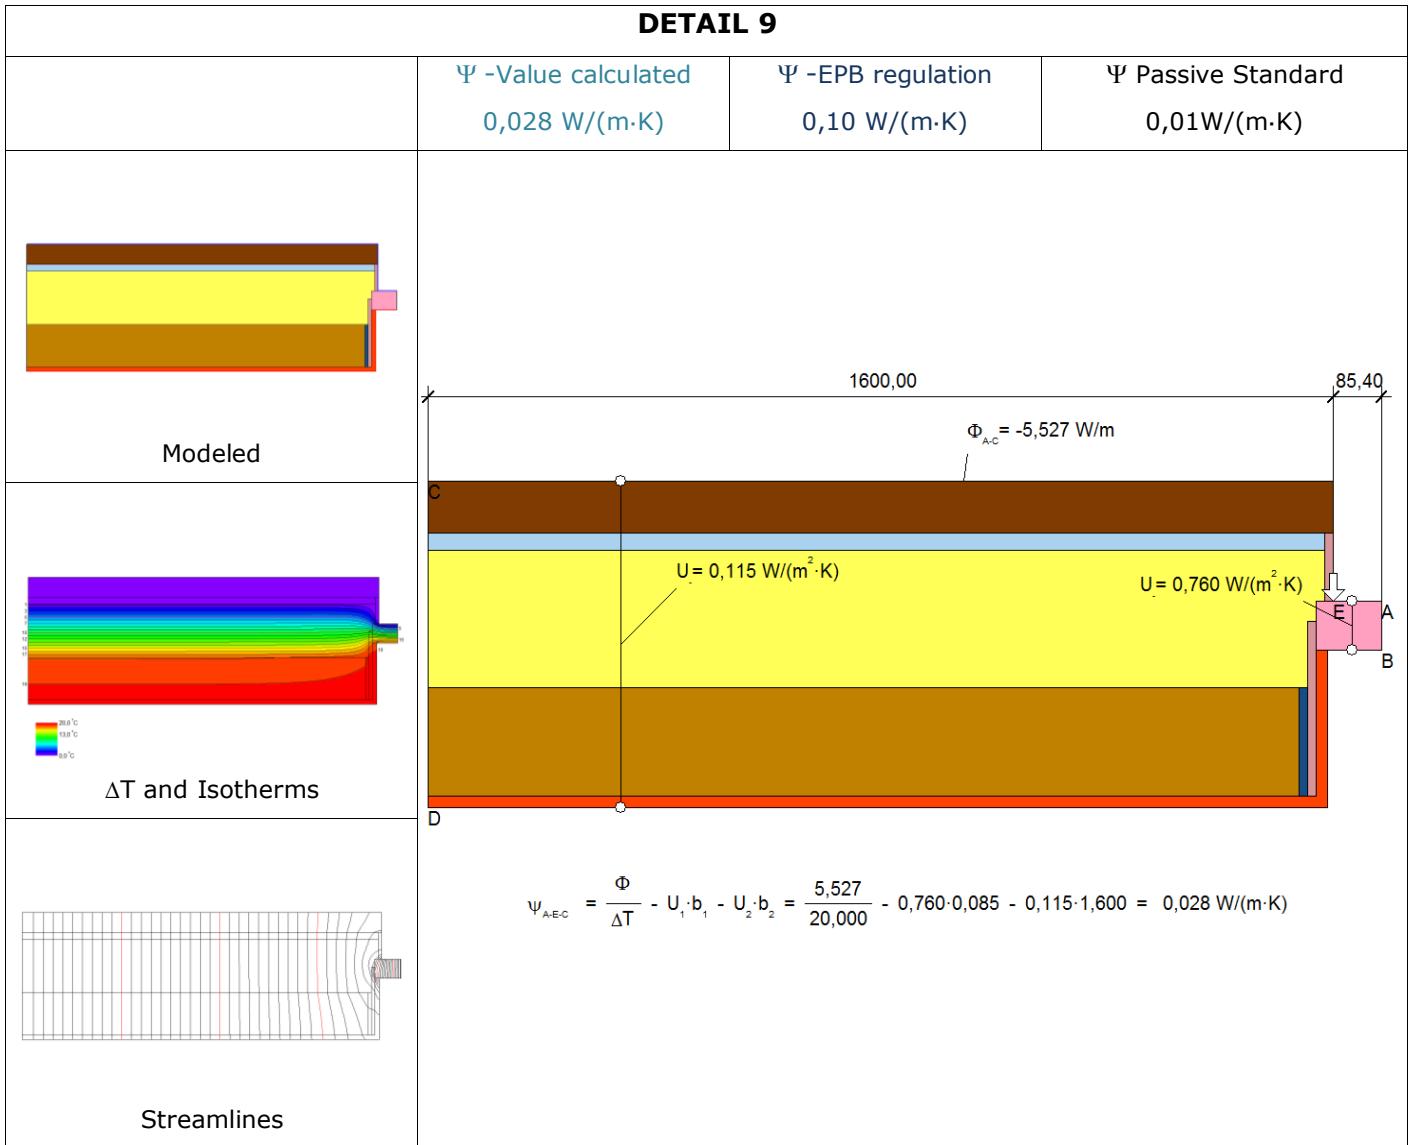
shows the results for detail 9, i.e. connection external wall to window frame on ground floor at the south side of the building (horizontal section). Timber is used to guarantee a continuous insulation layer.
